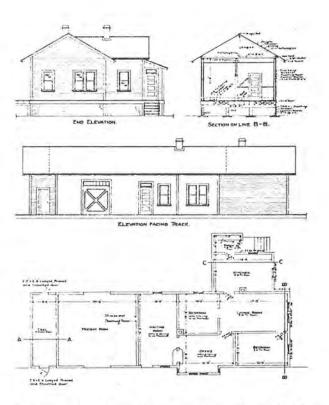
Canadian Northern's 4th class station plan 100-115.18
